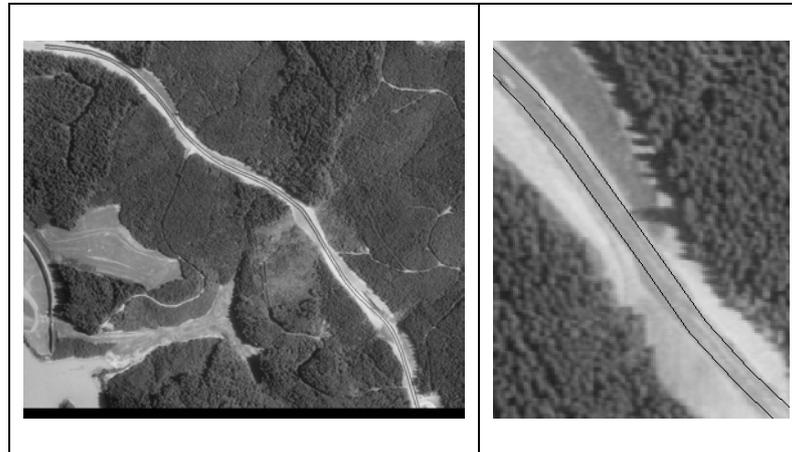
a. Horizontal alignment b. Roadway plan view with lanes
